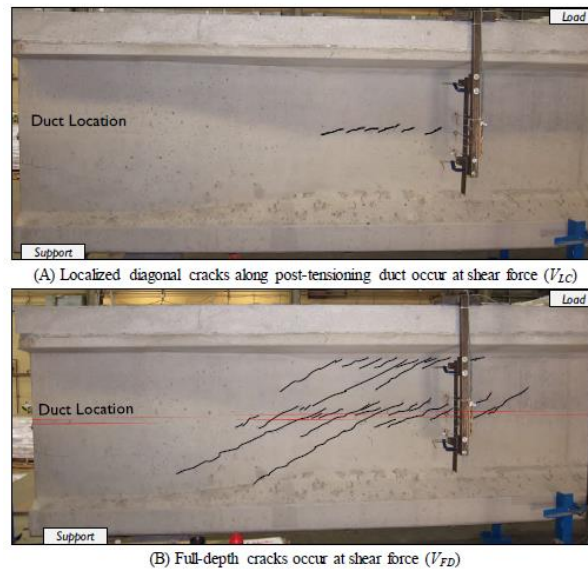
Localized and full-depth cracking of girders with PT ducts (Moore et al., 2015).
